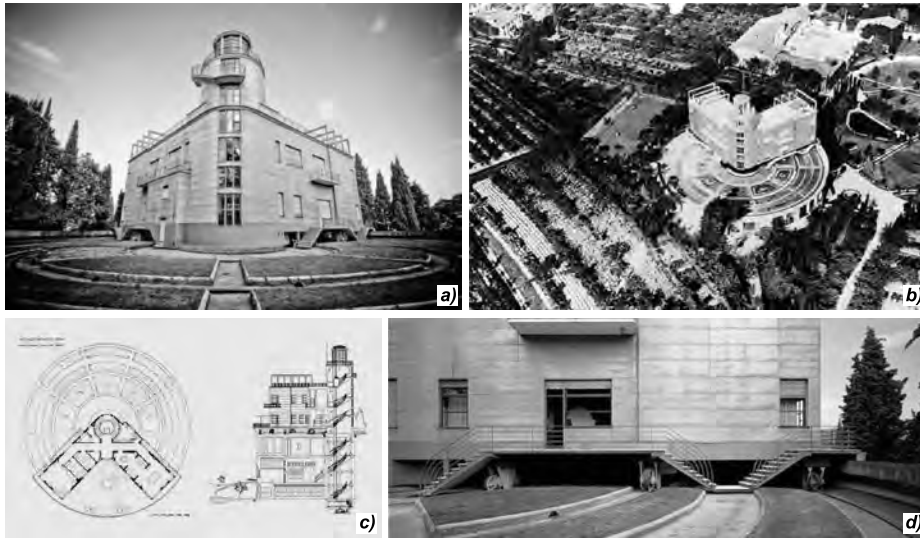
The Girasole country house: a) facade; b) general view; c) layout and section; d) a facade fragment
